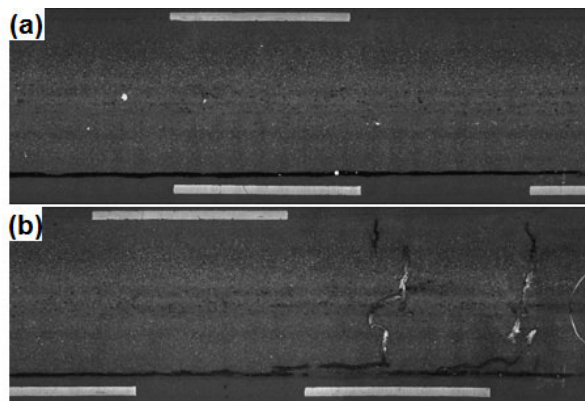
Pavement Surface Inspection (Trunk Road)
